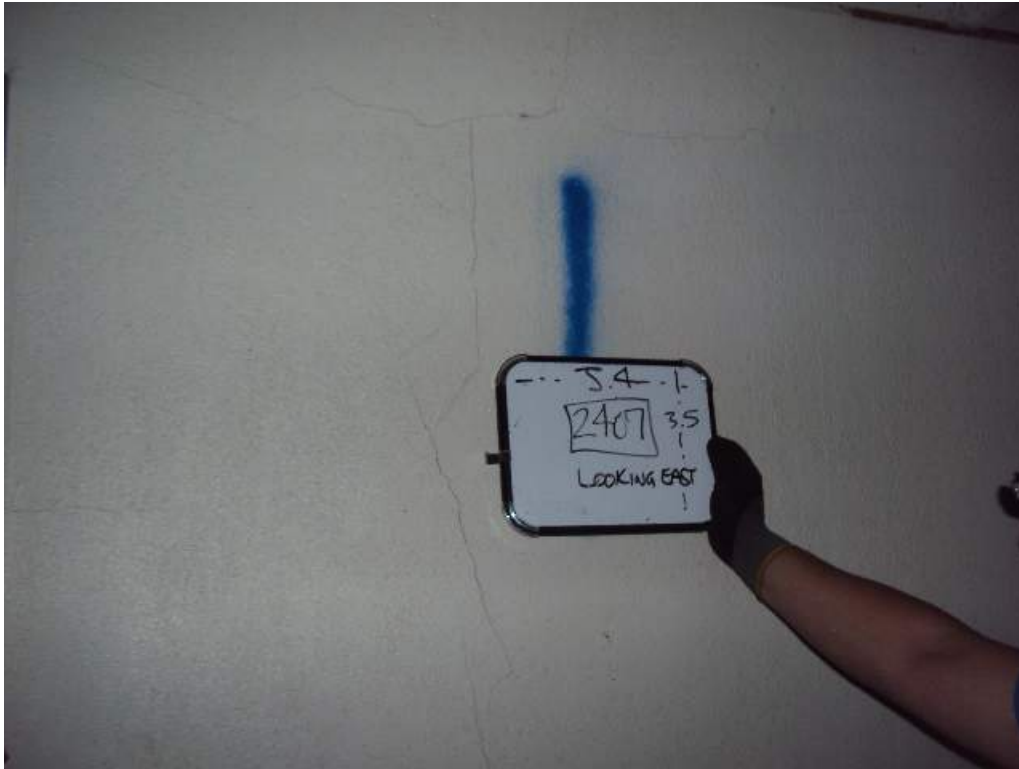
2nd Floor – Room 2407– At col lines J.4 and 3.5 – Looking East –Map cracking in the elevator CMU wall
